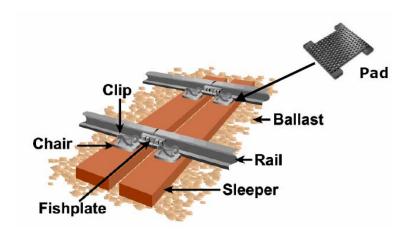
Typical rail track (Kaewunruen and Remennikov, 2008)
